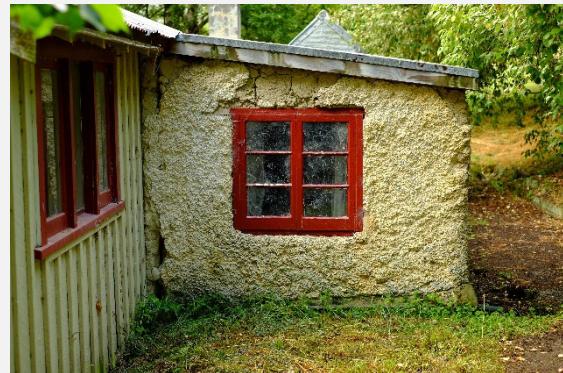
Cob lean-to at the rear (the other elevations of this are timber framed) (photo RKL 16 02 2024)
